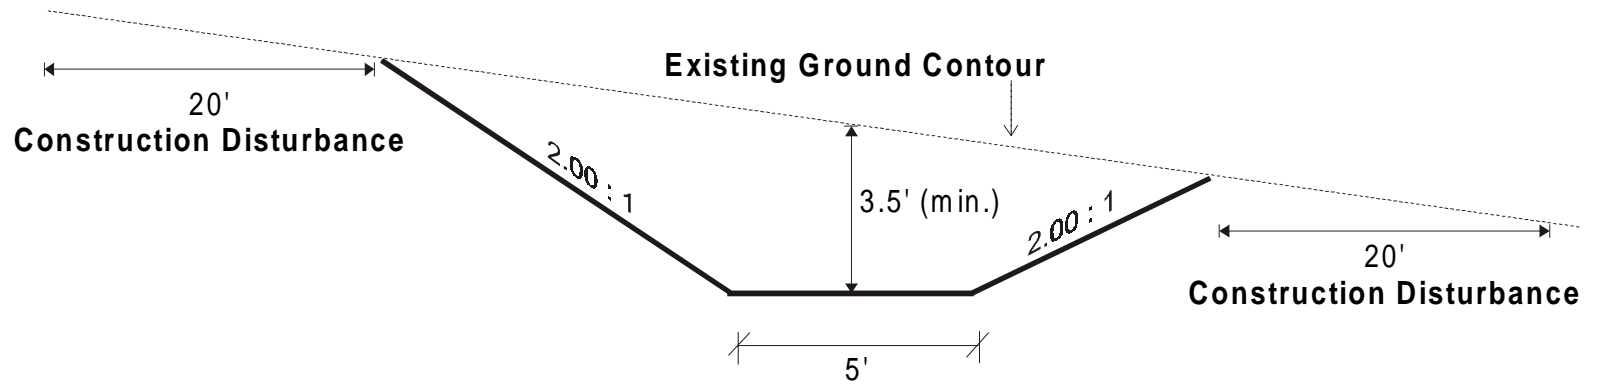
Open Ditch Alternative, Typical Cross Section
